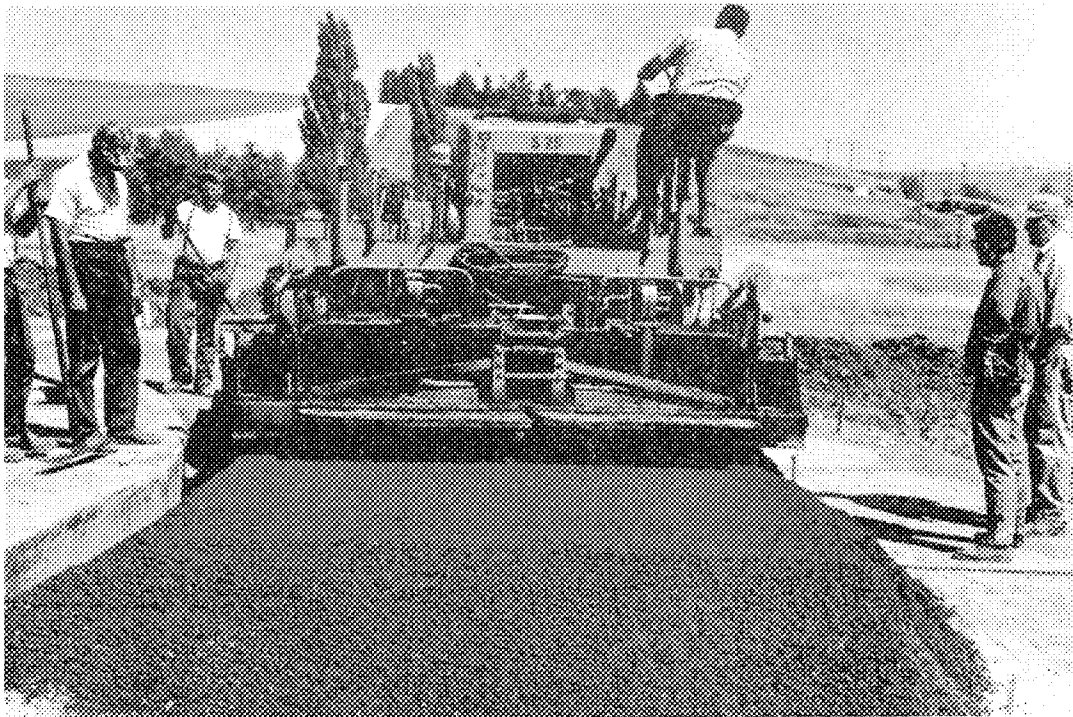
THE CRUSHED SURFACING TOP COURSE BASE IN SECTION 8 IS BEING LAID DOWN WITH A BLAW-KNOX PAVING MACHINE.
